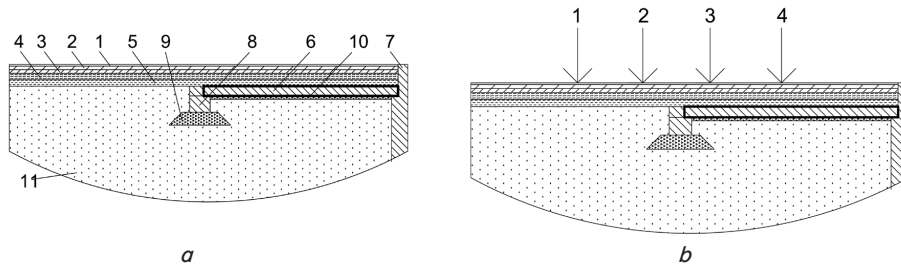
Scheme of connecting the bridge structure with the embankment of the approach: *a* – transition plate is arranged horizontally to the depth of the roadbed; 1–2 – layers of asphalt-concrete coating; 3–5 – base layers; 6 – transition plate; 7 – stoyan (shore support); 8 – lying down; 9–10 – crushed stone pillow; 11 – subsoil (drainage) – sand; *b* – load on a non-rigid roadbed from a four-axle vehicle
